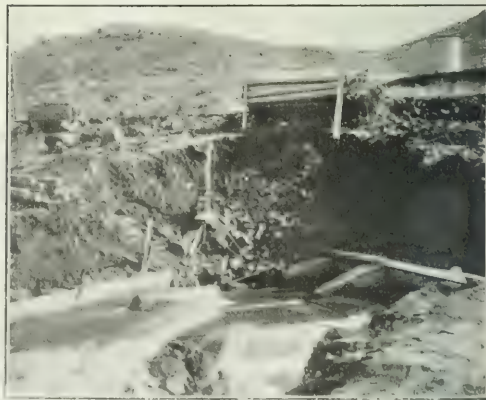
Temporary Spillway at Junction of Pressure Tunnel and Concrete Pipe.
